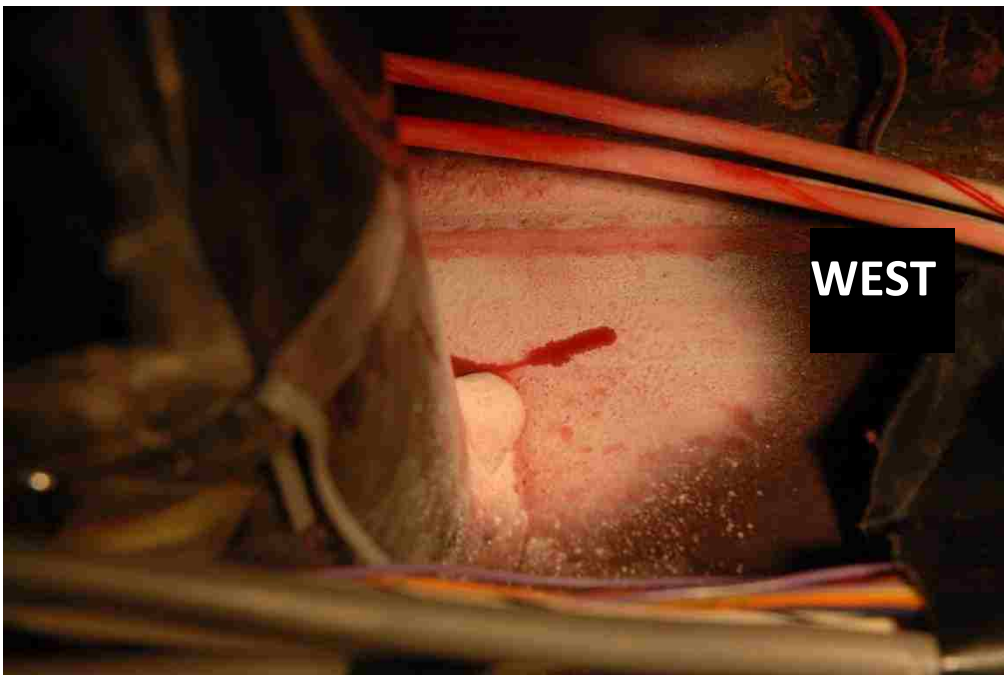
Specimen #1, crack at the west weld of the S5-T2 intersection
